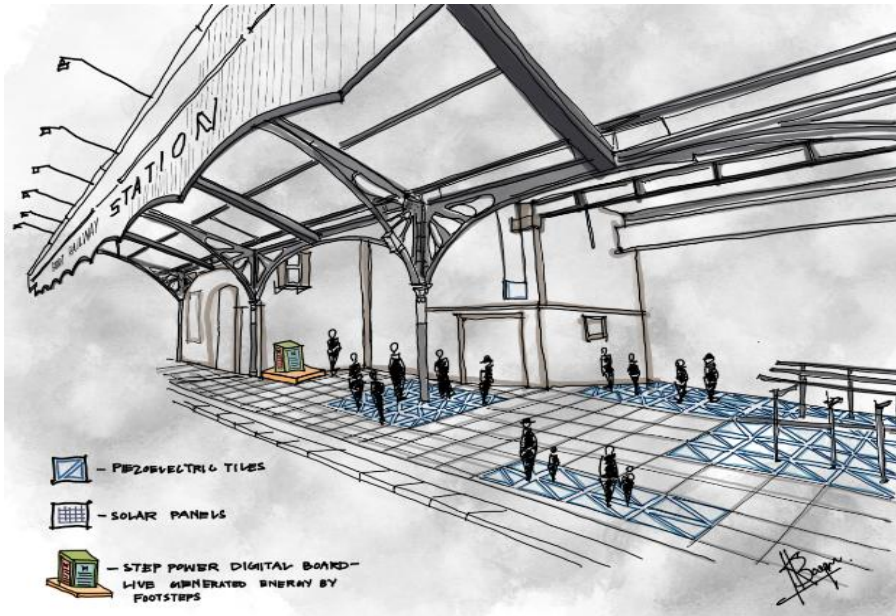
Proposed Piezoelectric Flooring for Fort-Railway station
